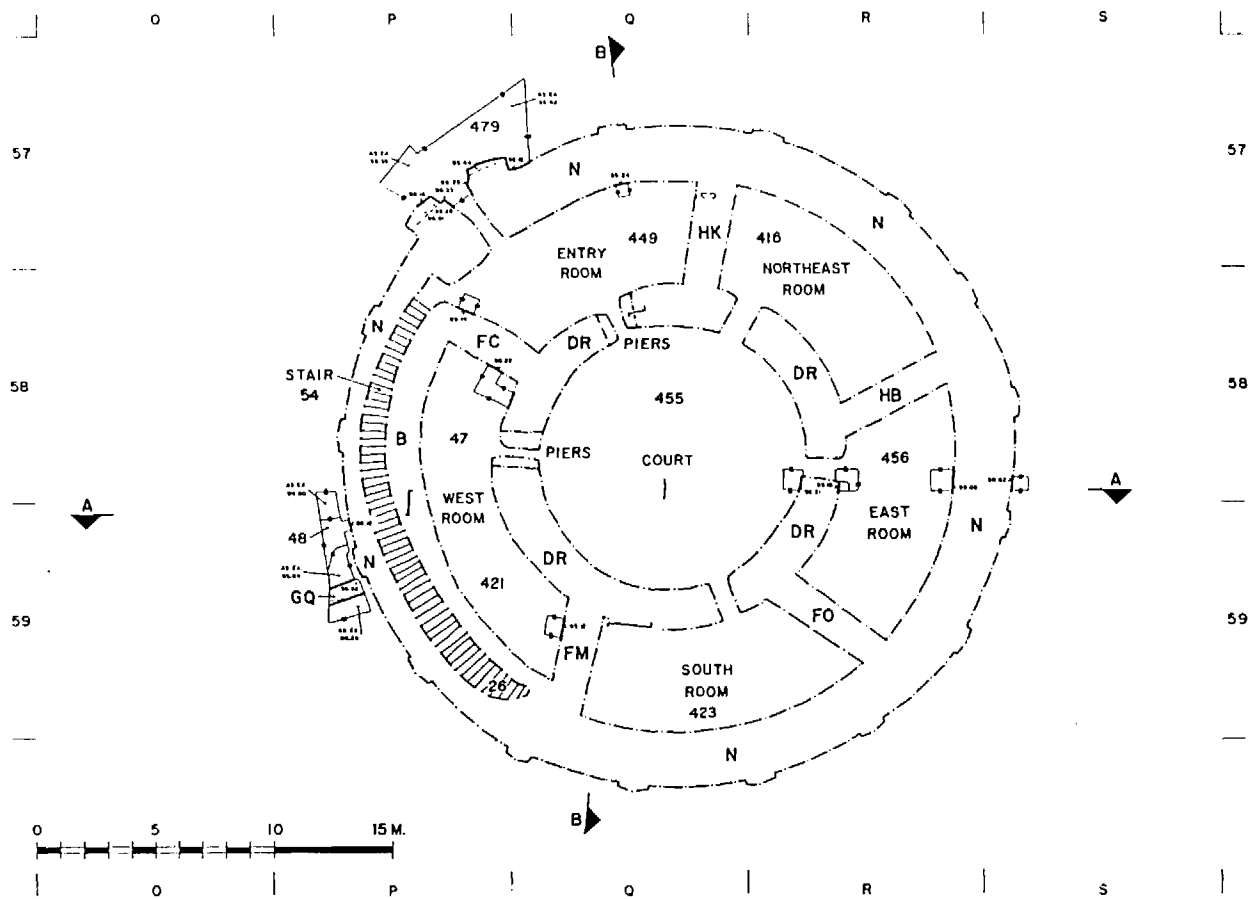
Plan, Razuk, Level VI B, lowest floor.
